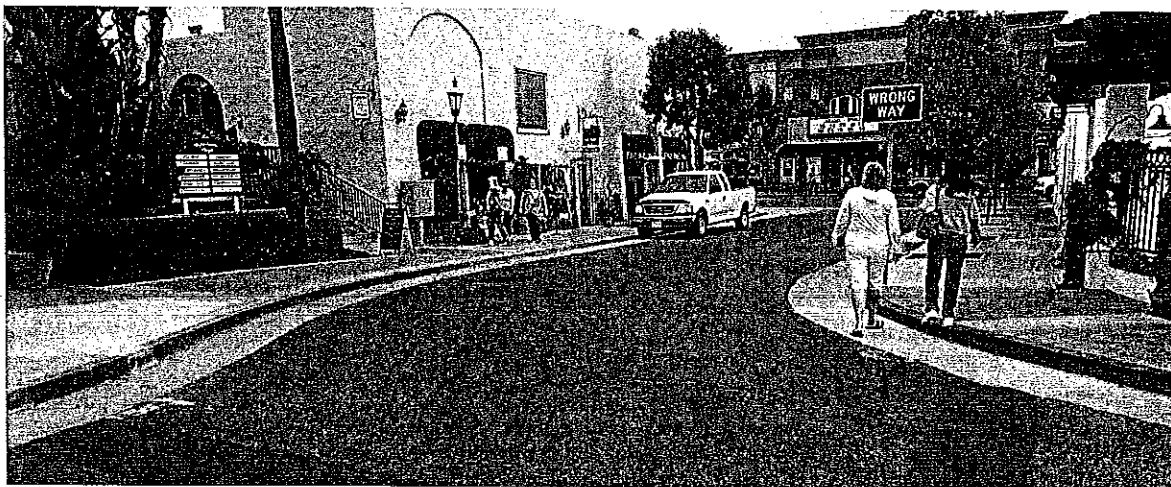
Photo showing Metrolink Station Parking Lot (part of pavement evaluation).
